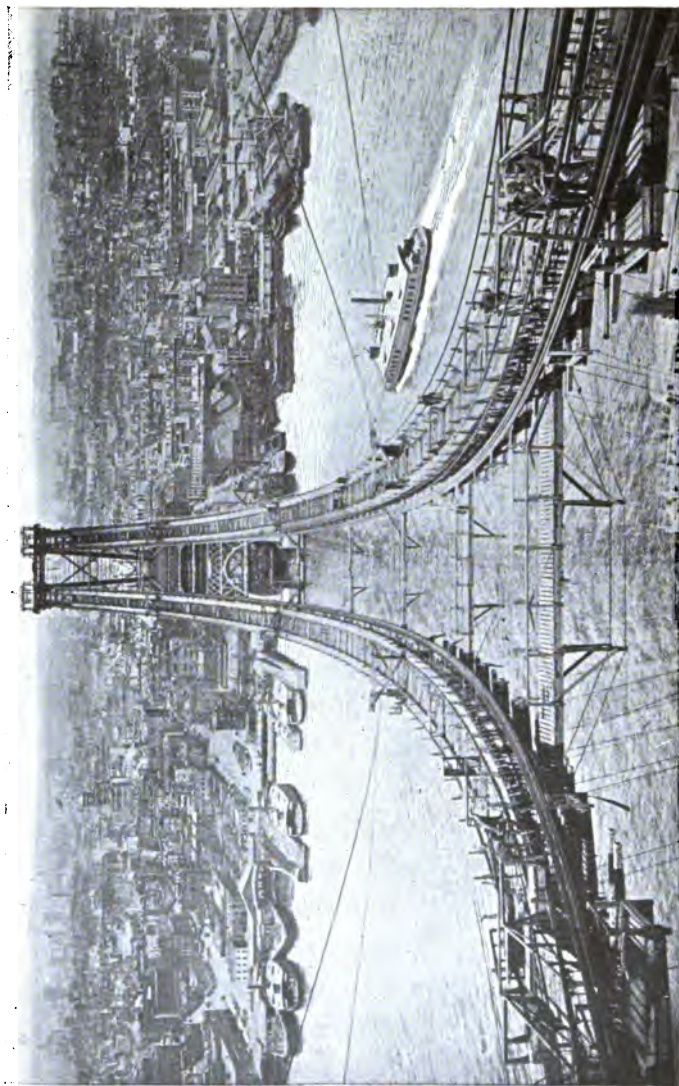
View of footbridge used for making the cables of the Williamsburgh Bridge.
